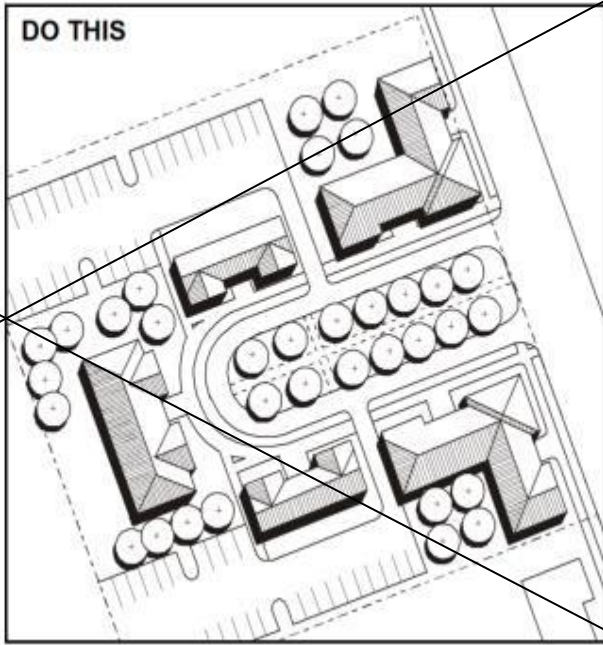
(E): Examples of breaking up parking and siting it behind buildings. Such development creates an attractive open space and avoids the impact of a large central parking lot.
